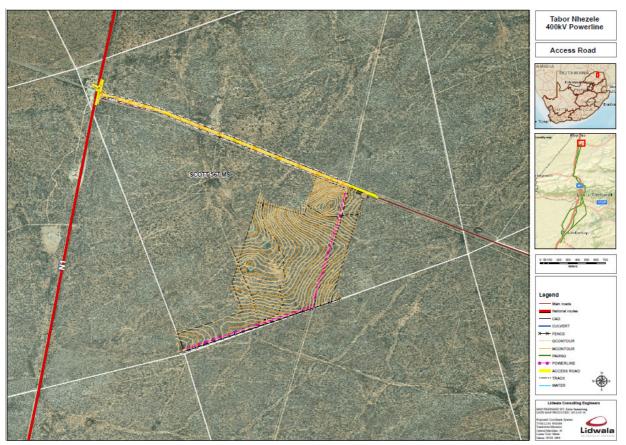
Access road proposed between the N1 and the Nzhelele substation
